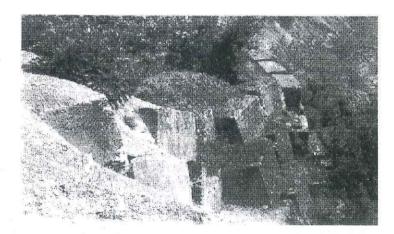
Bogova landslide. It's looking to east, and shows, a destroyed retaining wall (deformed) by mass movement
